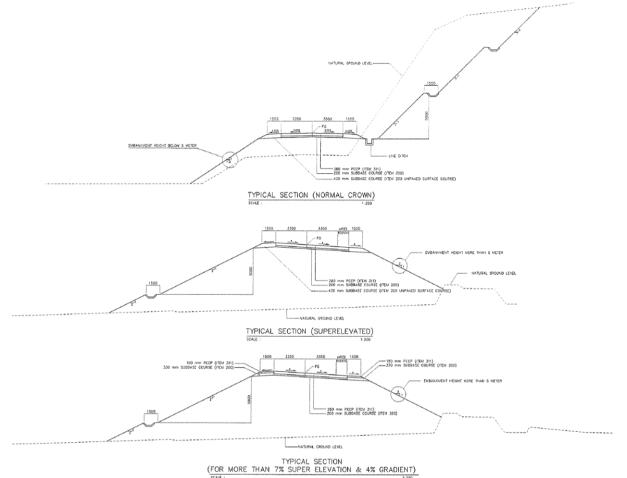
Typical Section for Norman Crown, Super Elevated and More than 7% Super Elevation & 4% Gradient)
